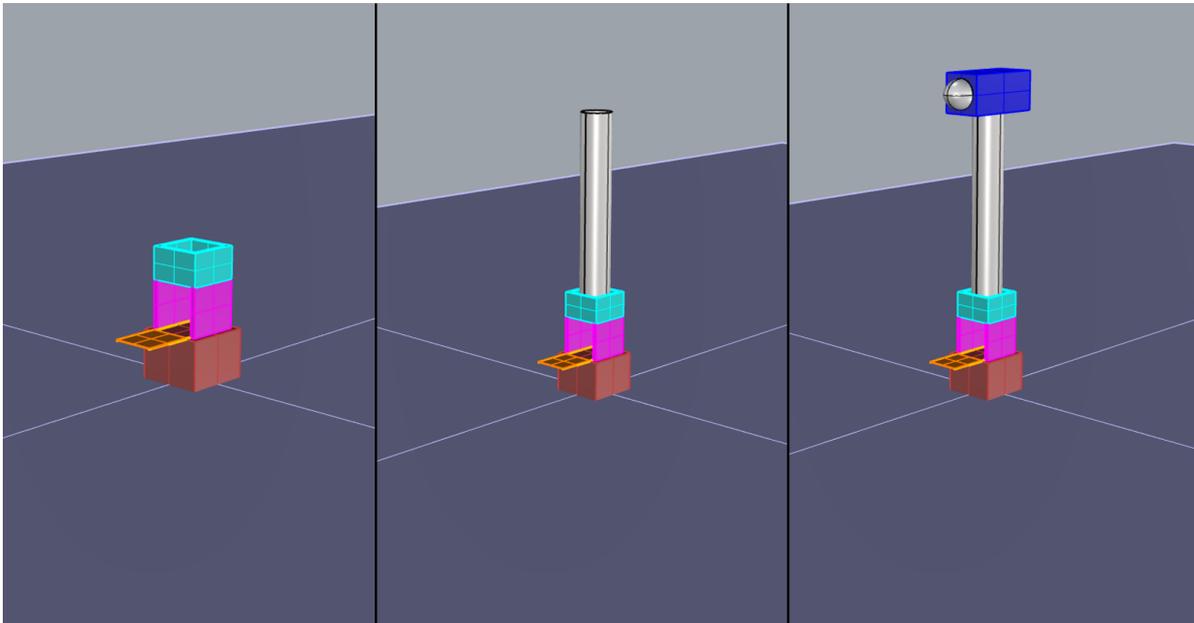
Story board installation using jack-up tower concept, part 1, Left: installation of jack-up mechanism and support frame on foundation, Middle: installation of tower piece with initial tower height, Right: installation of nacelle.
